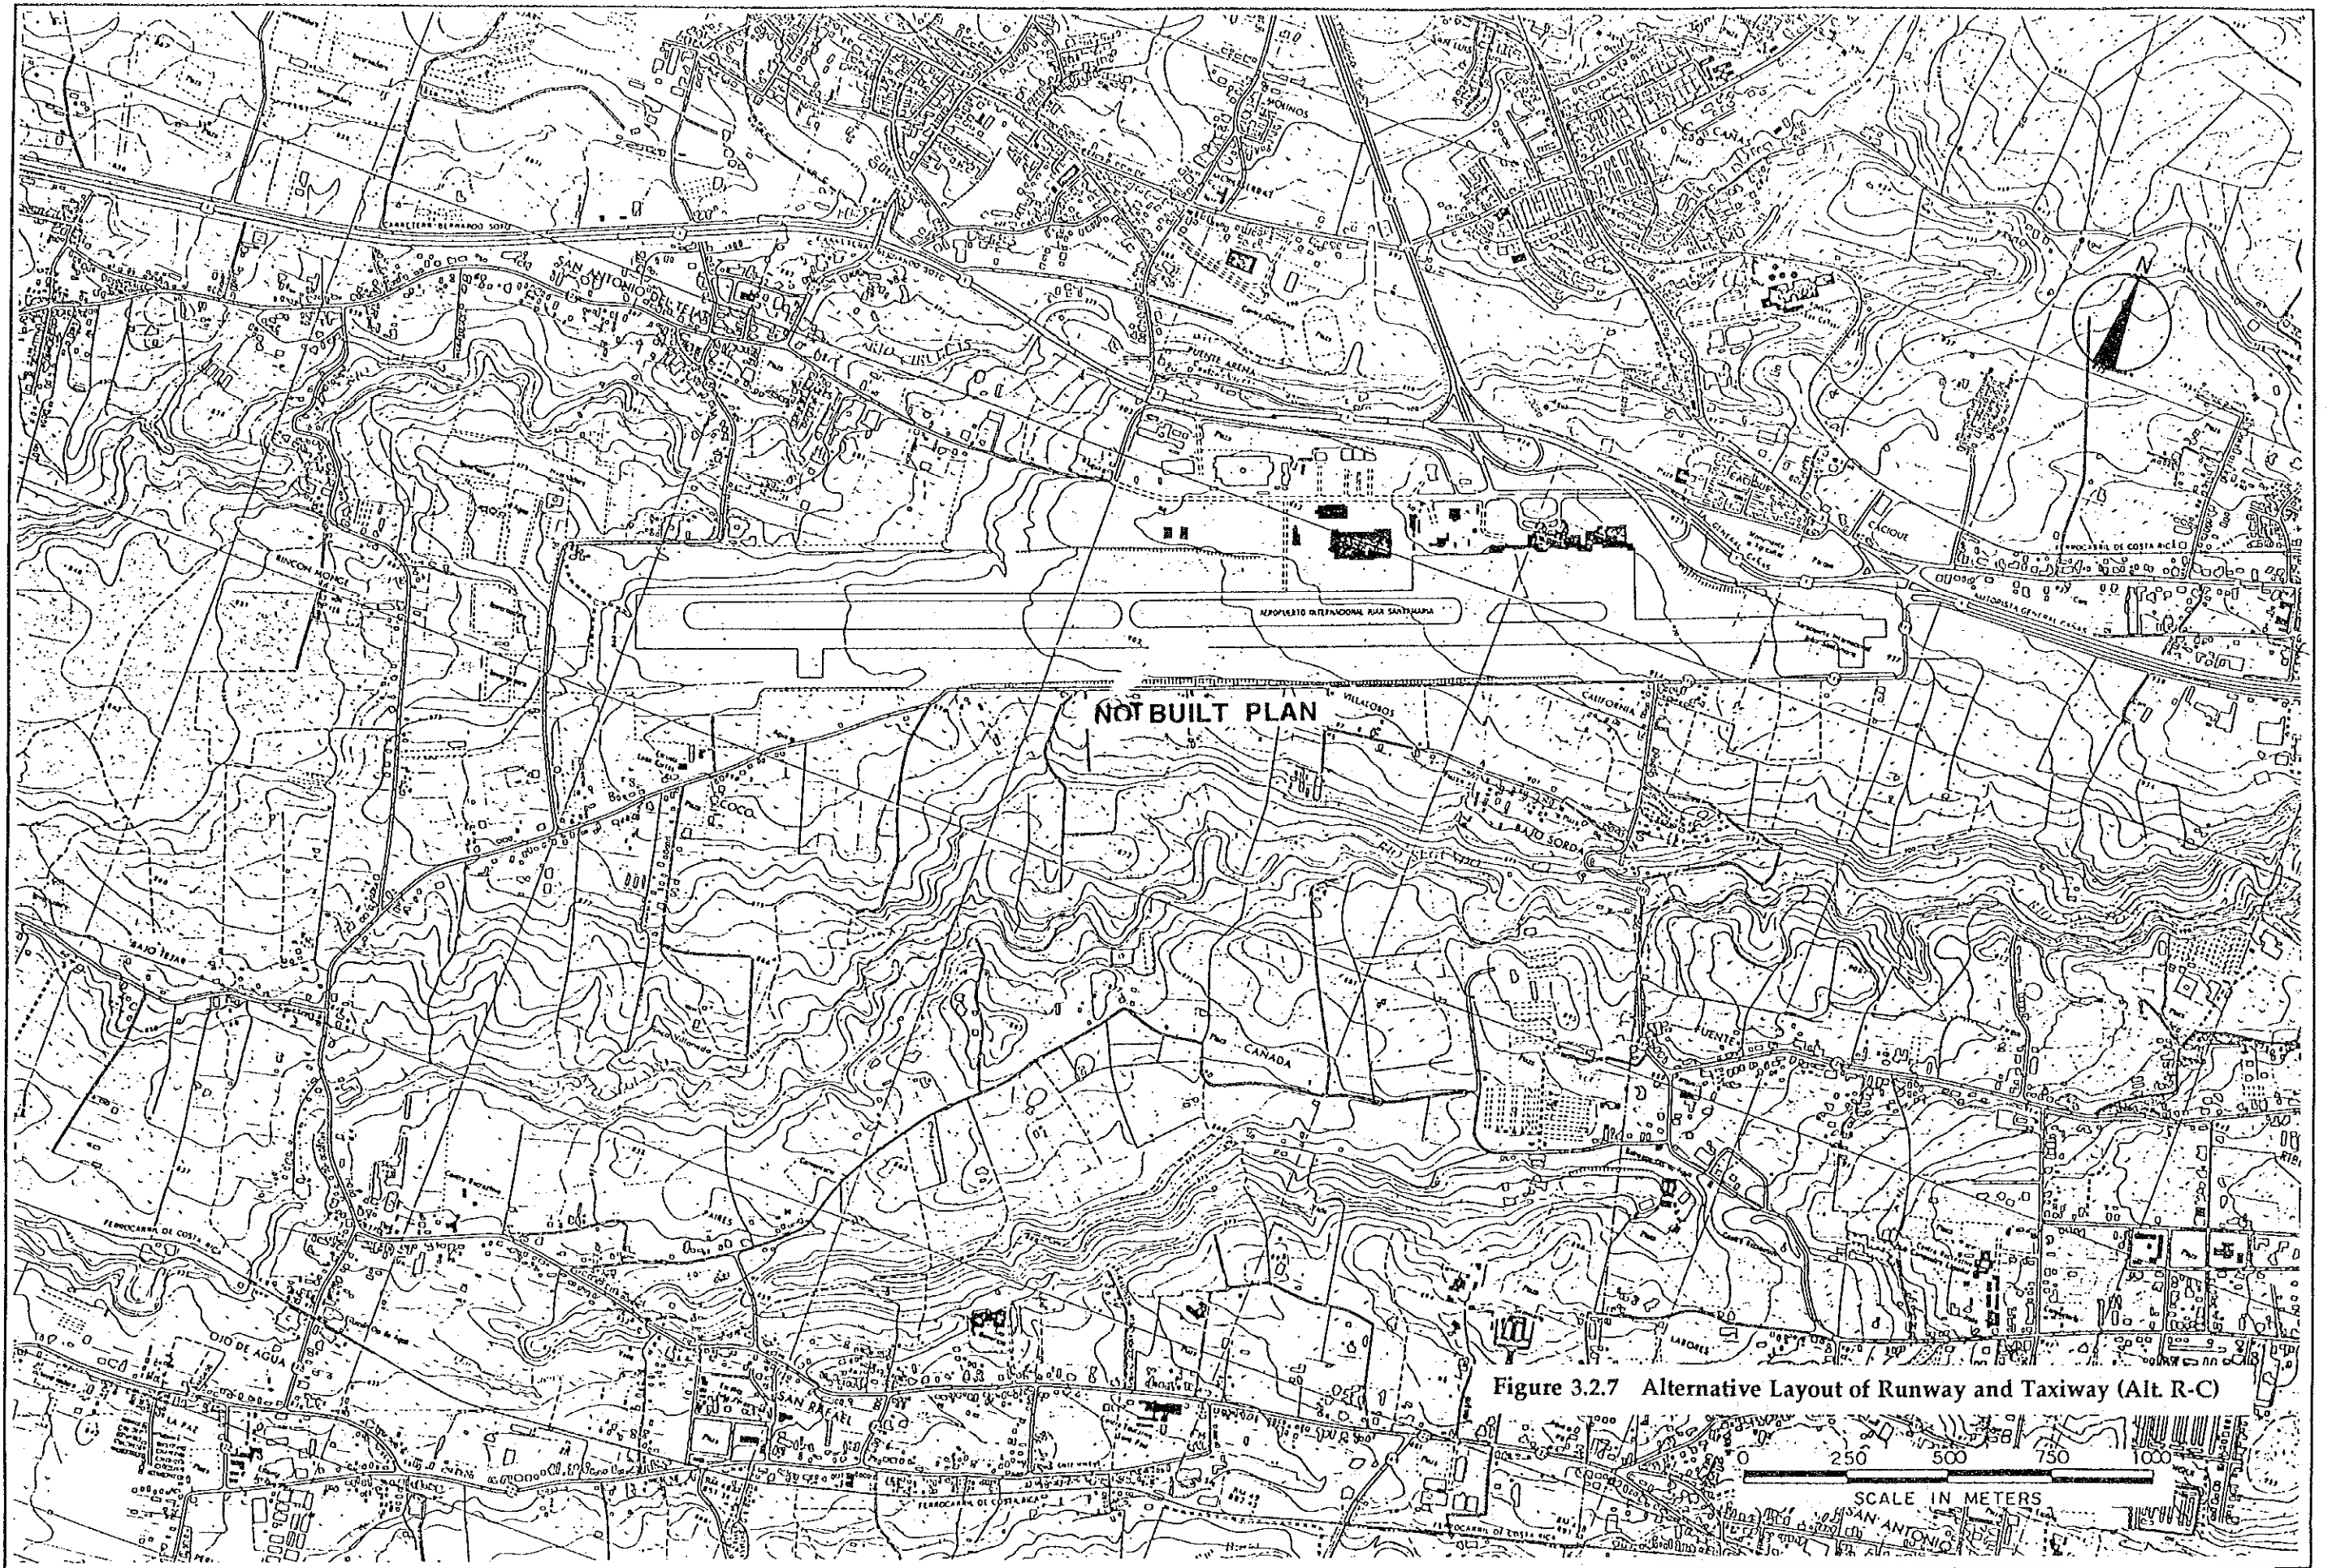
Alternative Layout of Runway and Taxiway (Alt. R-C)
